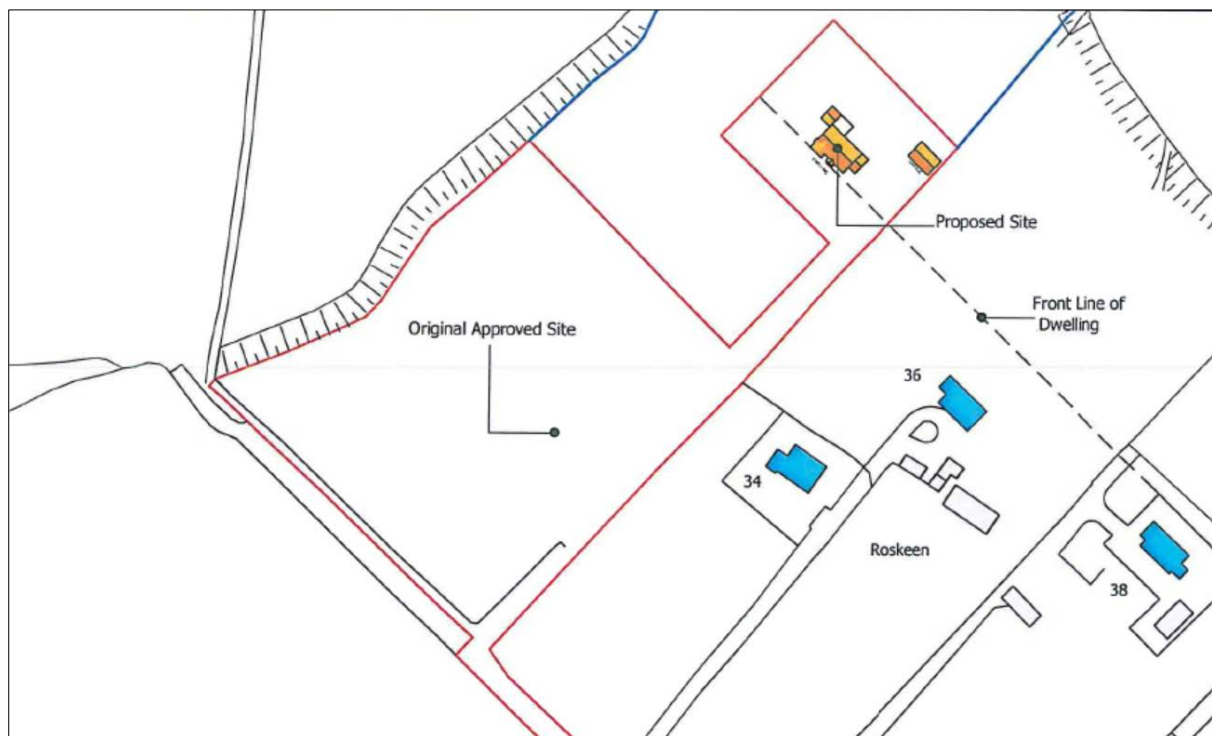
Current site location plan showing approx. location of previously approved dwelling and garage; and location of the change of house type including garage proposed.
